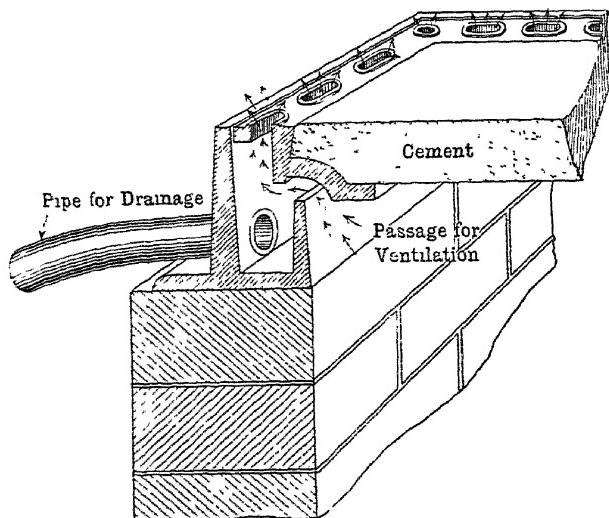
VENTILATED, DRAINED AND HINGED MANHOLE COVER.
